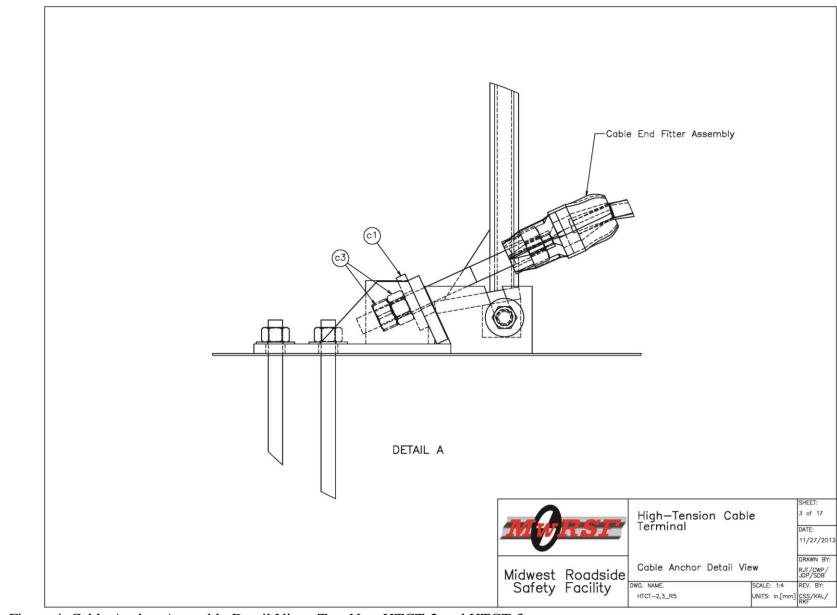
Cable Anchor Assembly Detail View, Test Nos. HTCT-2 and HTCT-3
